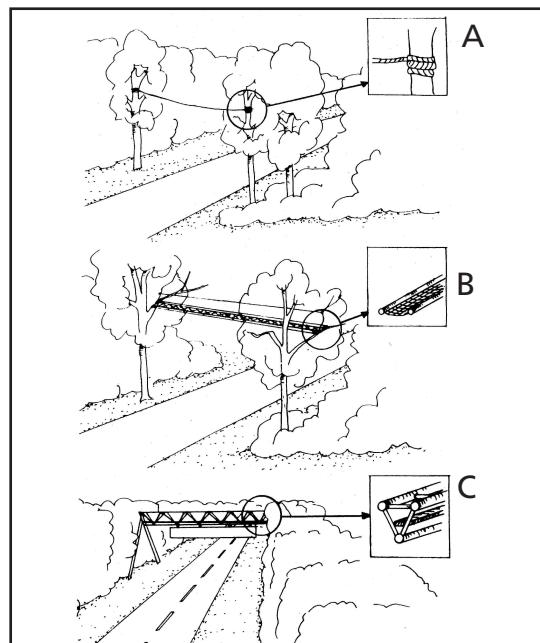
Climbing mammals can use constructions over roads. Design details of A: a rope, B: a walkway of two steel cables with a net between, and C: adaptation of motorway signage.
